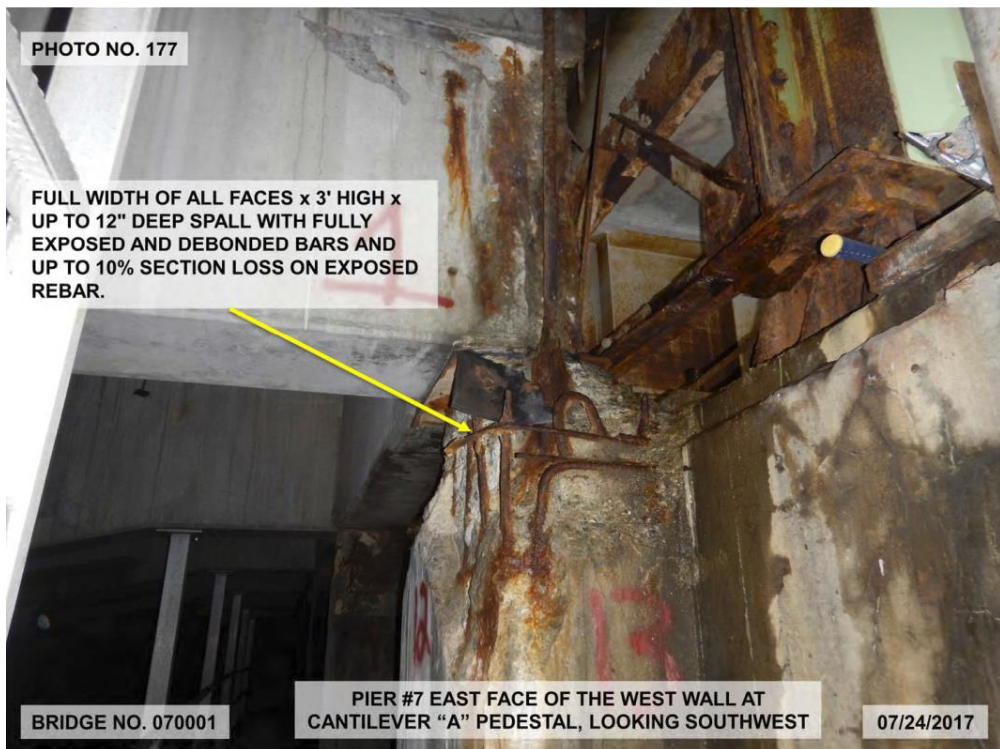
Inspection photo of exterior tie-down rod for cantilever beam A at Pier 7 taken July 2017 (Collins).
